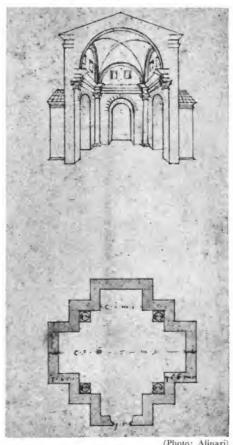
S. Prassede, Palladio, Plan and elevation of chapel of S. Zeno
